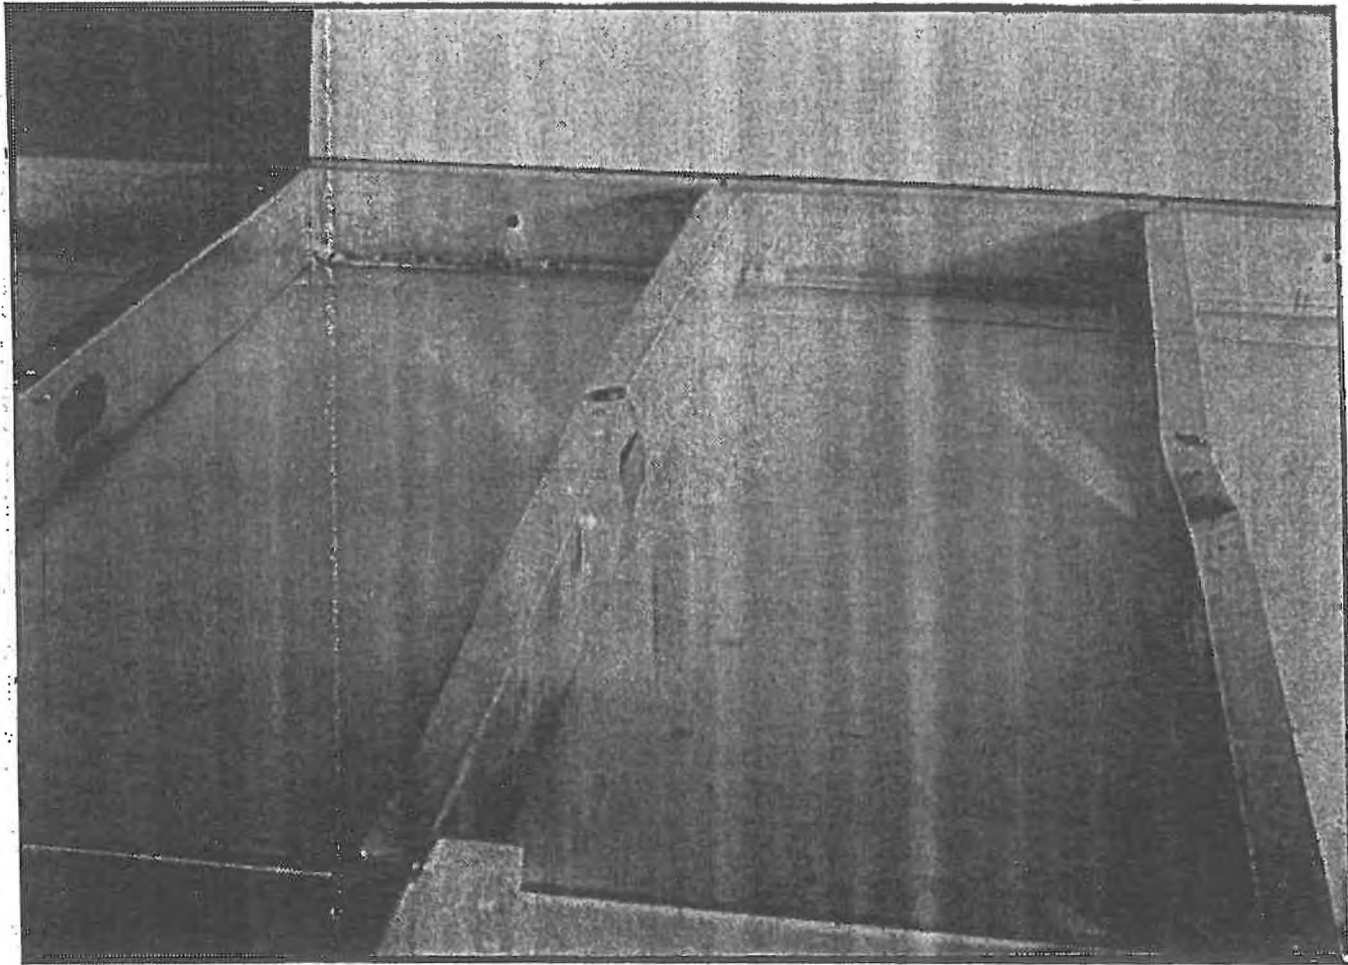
Photograph of Failure of Specimen 4-BW-1
